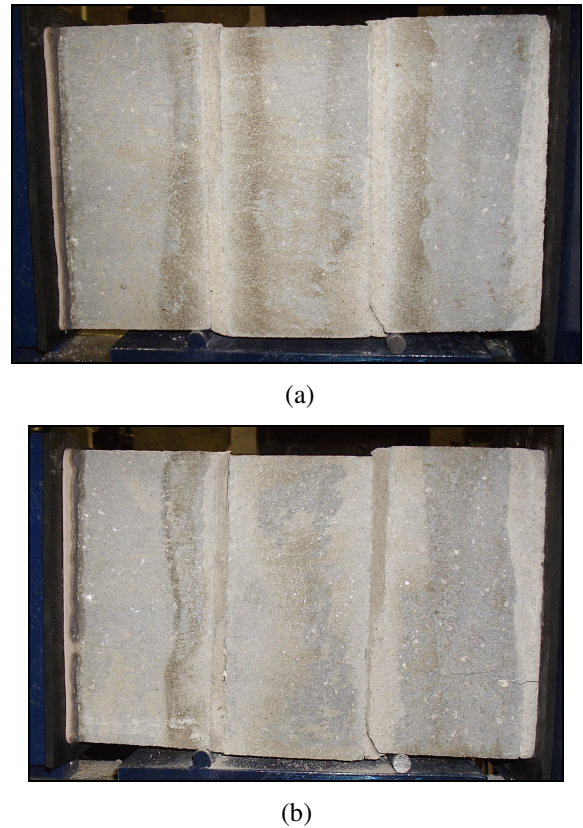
Failure mode of shear tests: (a) sliding and (b) sliding with horizontal crack.
